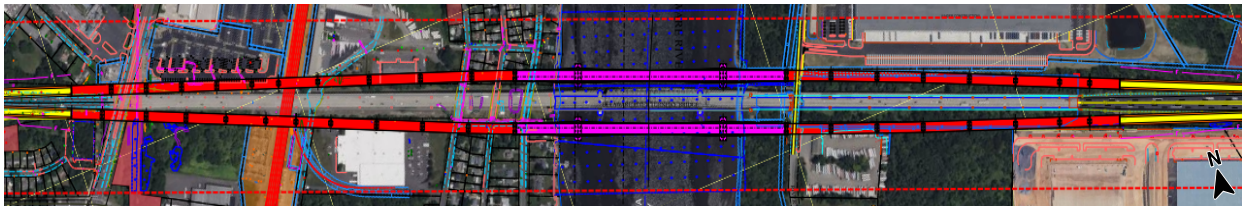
Alternative DPI: Dual Partial Impact to existing approach spans
